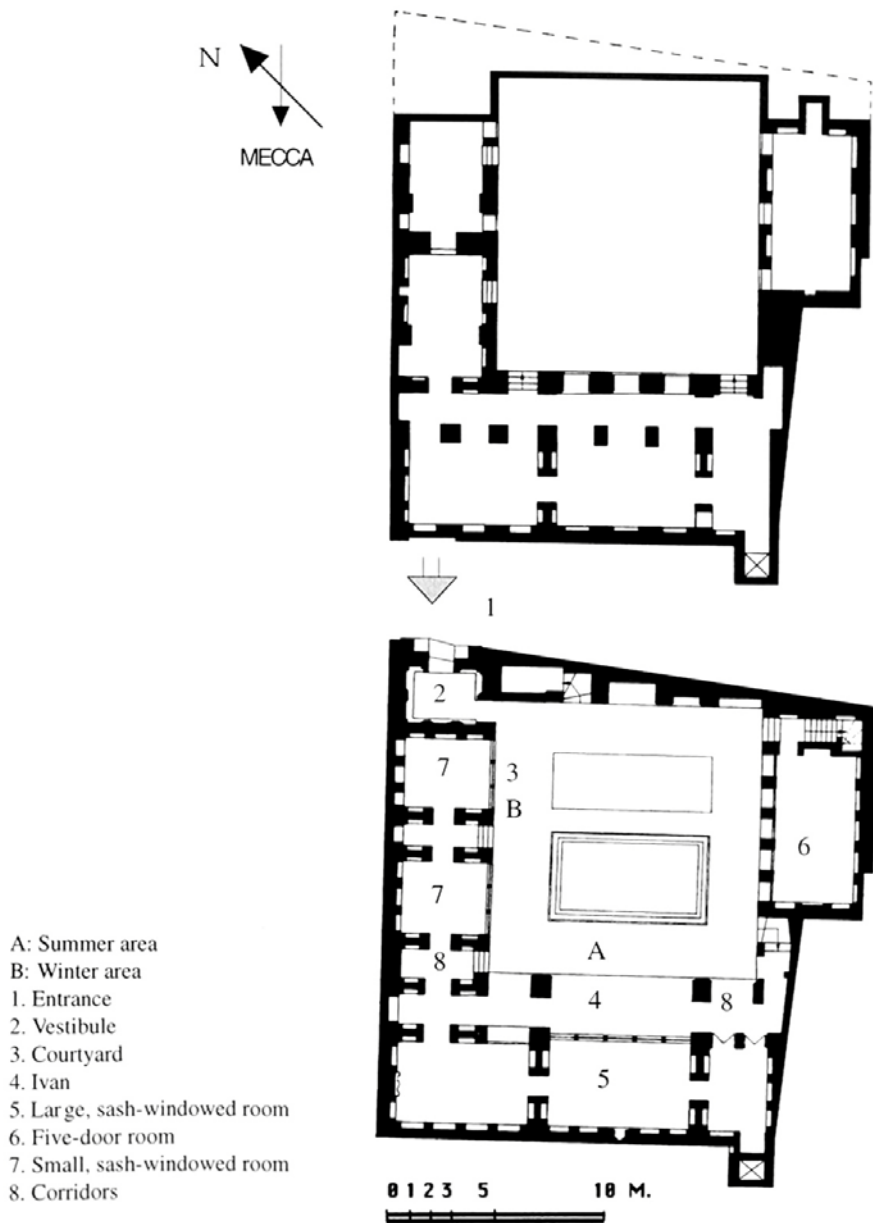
Mantegi Nejad House with basement plan on top and ground floor layout below. Larger living areas are located in southern part of the city to avoid direct sunlight in hot season (source: Memarian 1998)
